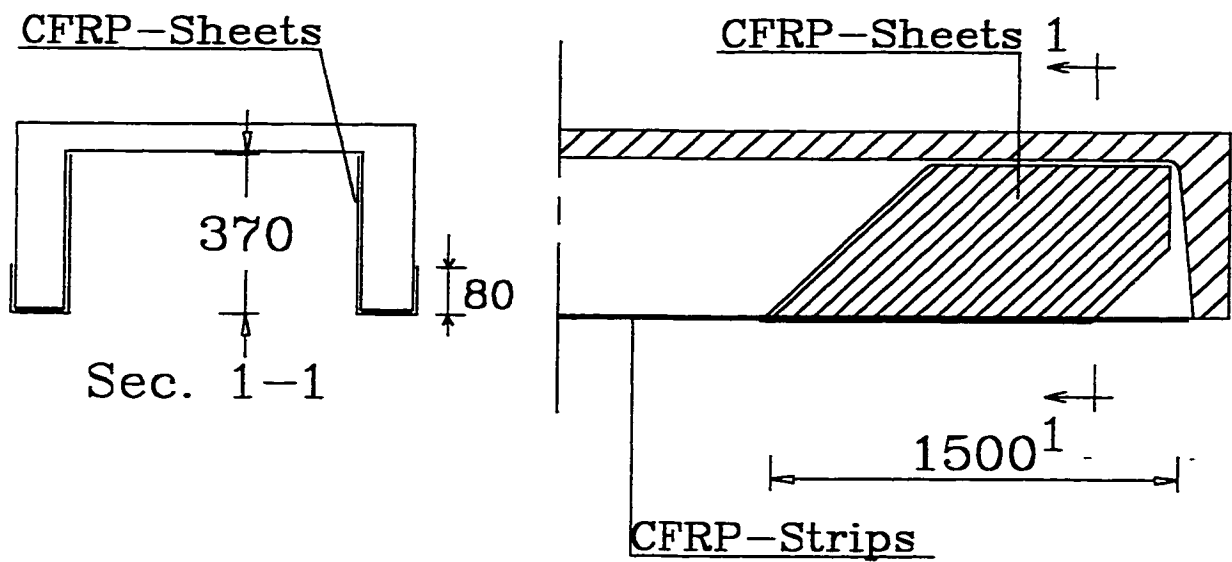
1 Schematic Showing CFRP-Sheets/ Strips on the Beam (Dimensions in mm)
